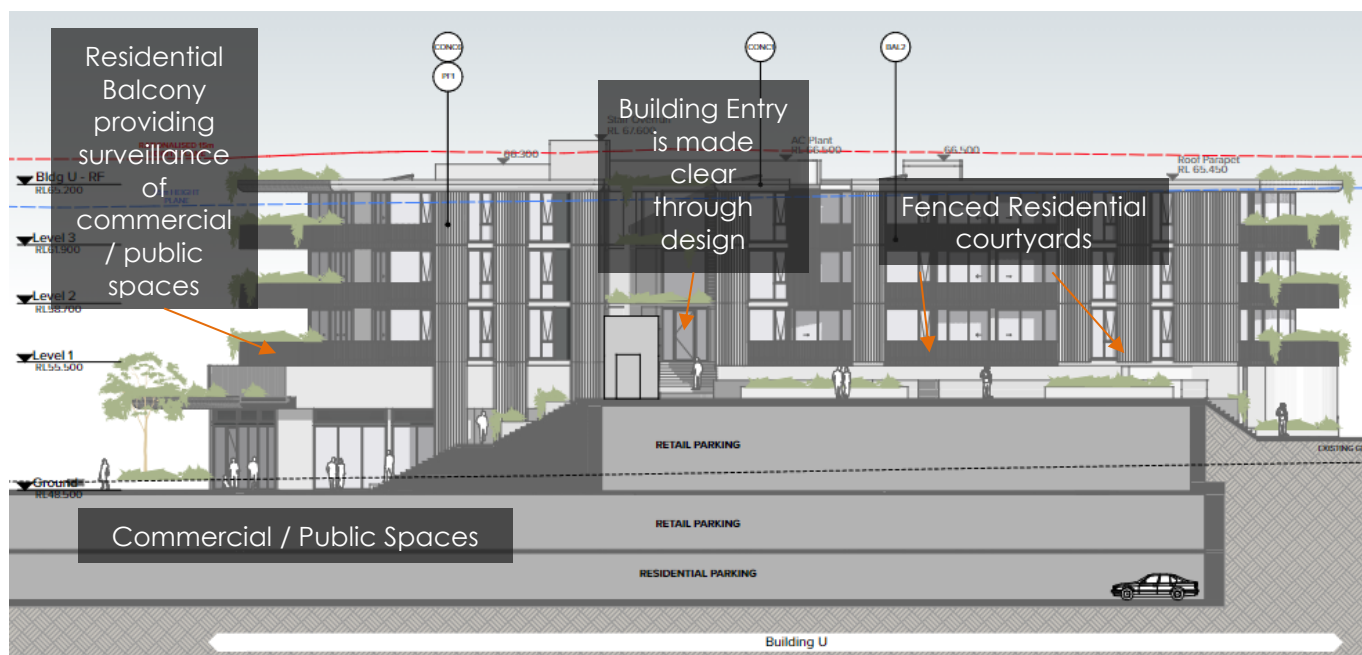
Extract from Building U Southeast Elevation (Source: Turner, 2024)
